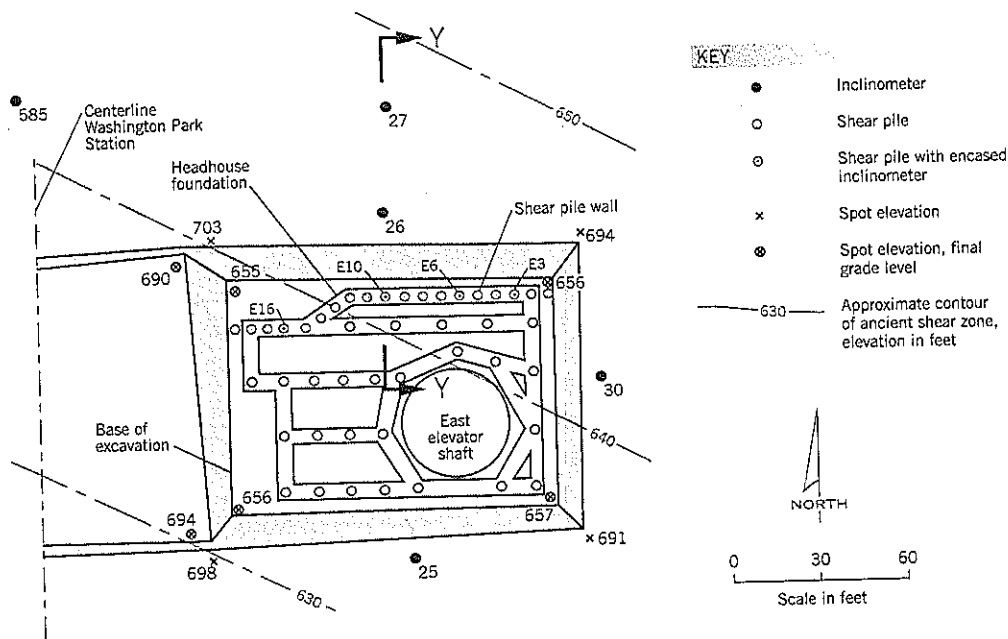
Washington Park Station. East Pit excavation showing shear pile wall and foundation.
